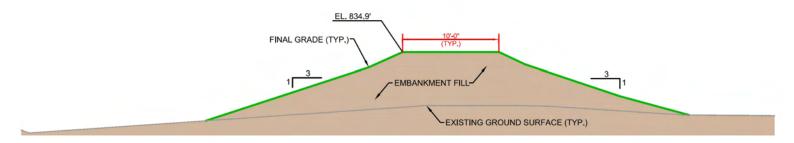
Tellico Dam – Raised Earthen Embankment Concept for Segment T-3 (Saddle Dam No. 2)
